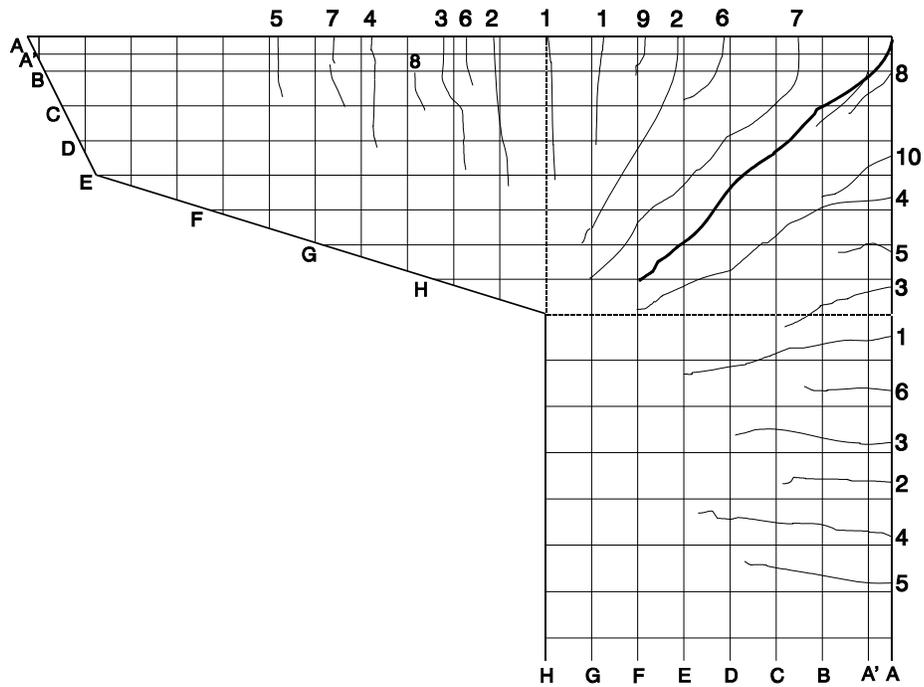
POJ-RC-100 cracking pattern on south face of specimen at failure
